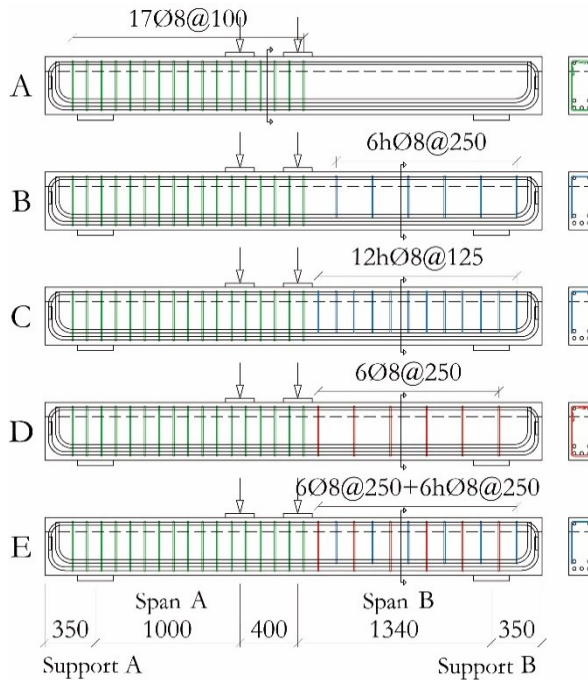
Reinforcement layouts of the test specimens for the characterisation of the interface between concretes (dimensions: mm).
